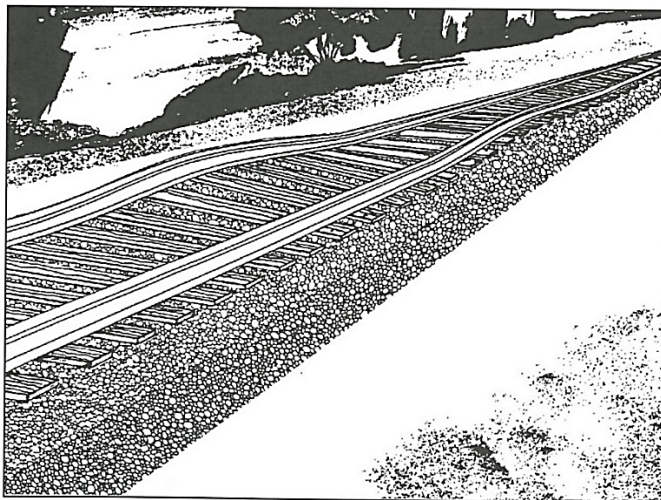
Figure SUB-PART C – 26 – Surface Defect Example
